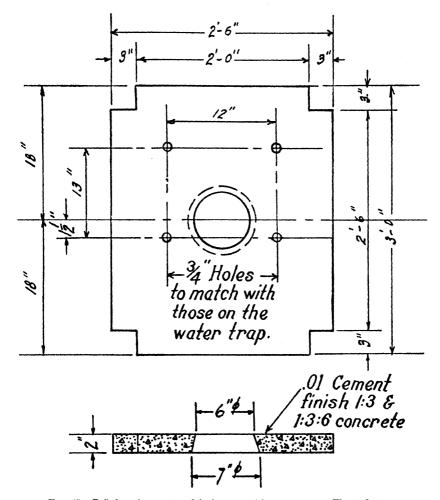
Reënforced concrete slab for use with water trap. Elevated type.
